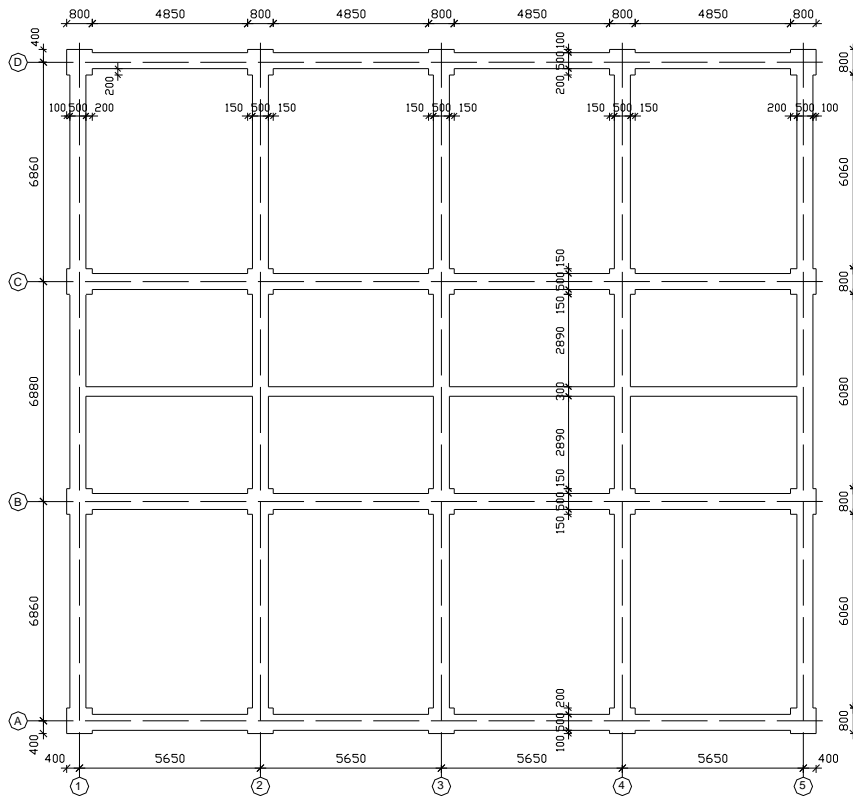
Plan of the foundations of four residential houses unified by one base isolated R/C rigid slab
